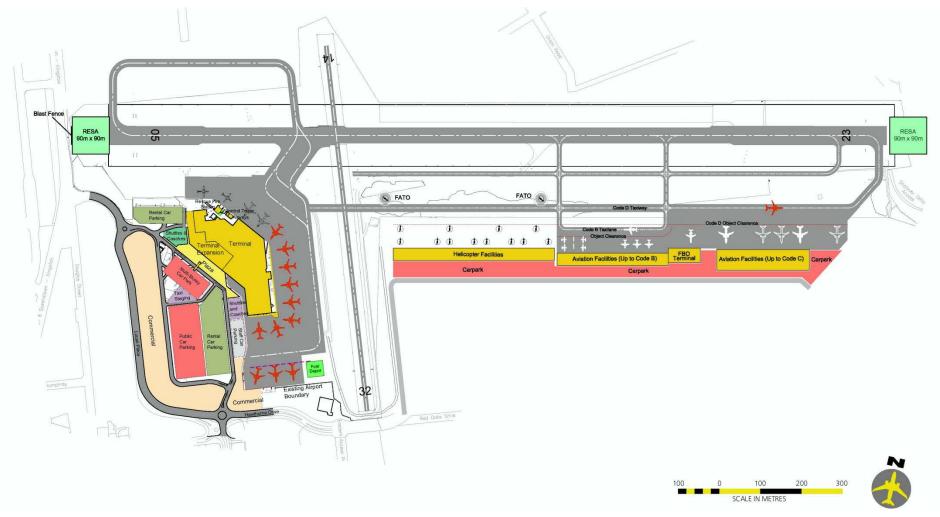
UPDATED QUEENSTOWN AIRPORT MASTER PLAN
